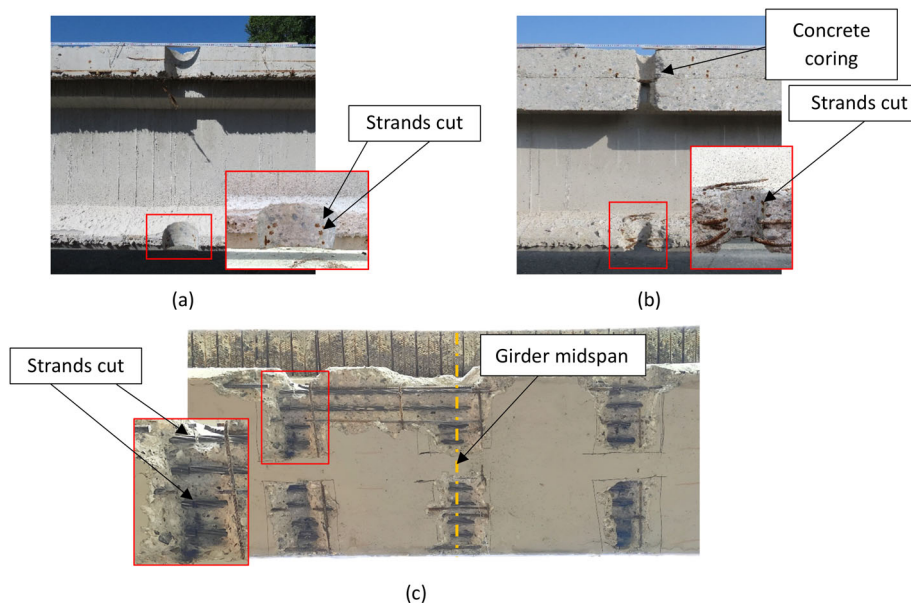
Damage detail for girders: (a) G07 lateral view, (b) G08 lateral view, and (c) G09 bottom view.
